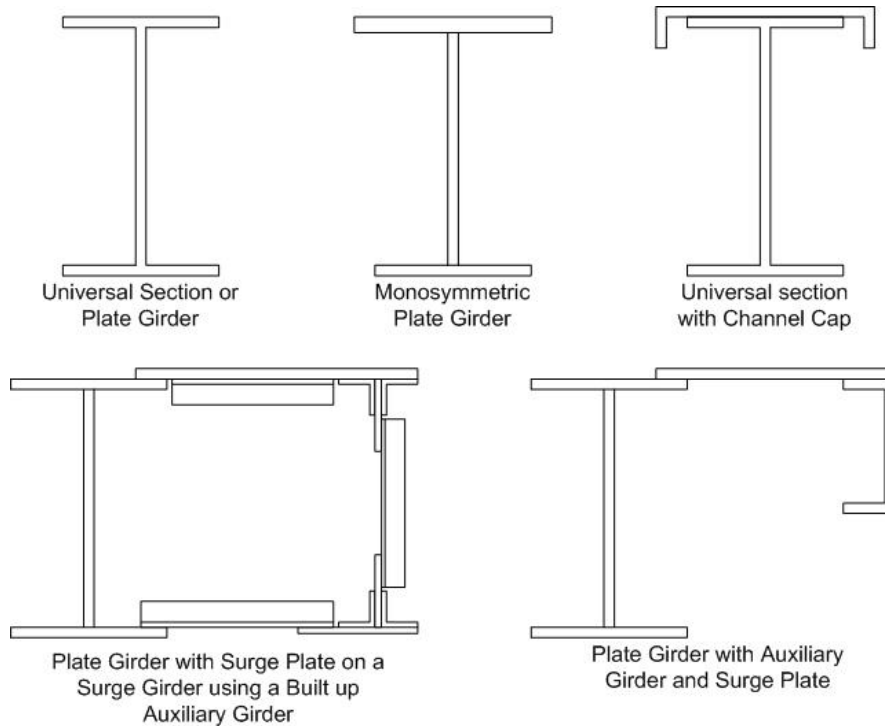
Several examples of crane runway girder sections. (Not to scale) [Goldman 1990]
